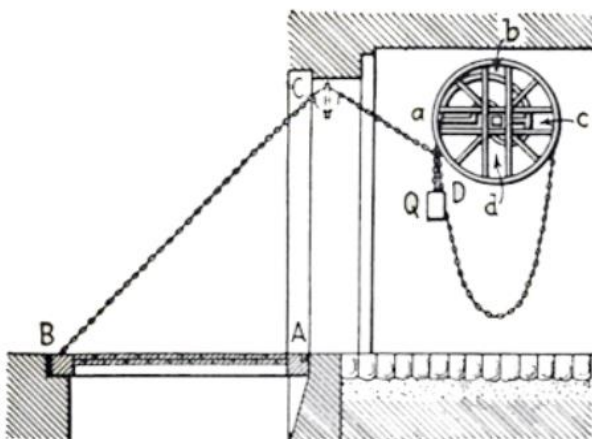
Typical 'draw' Bridge (Berger, Healy, & Tilley, 2015) Figure 2.3 – Oldest 'draw' Bridge (Hovey, 1926)
